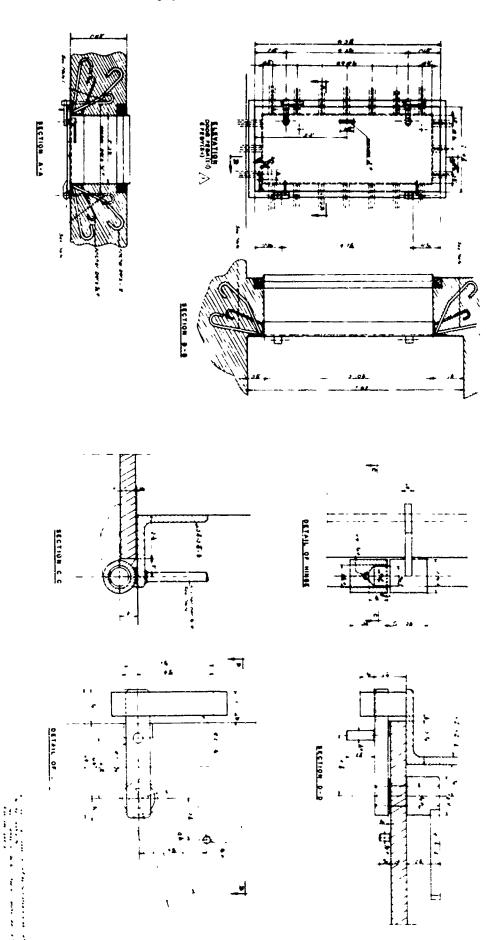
Rectangular shelter, type 60, fire door at location F1.
